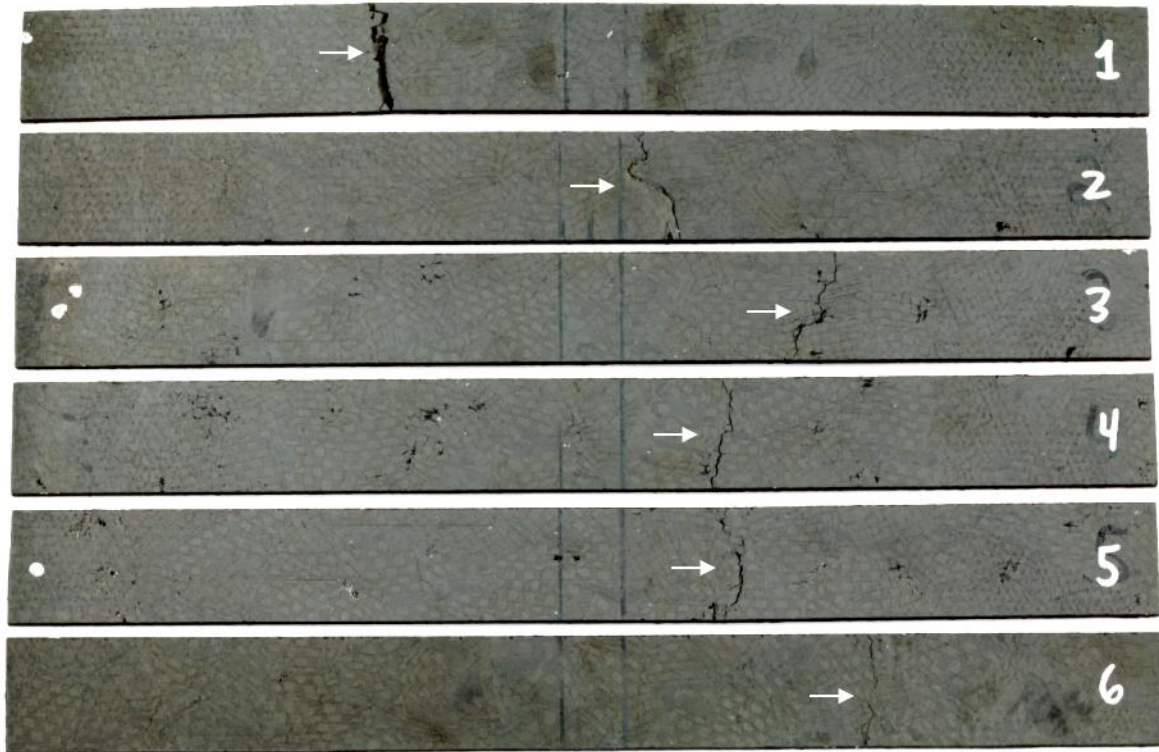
Picture of tested M23 specimens; white arrows indicate the location of failure.
